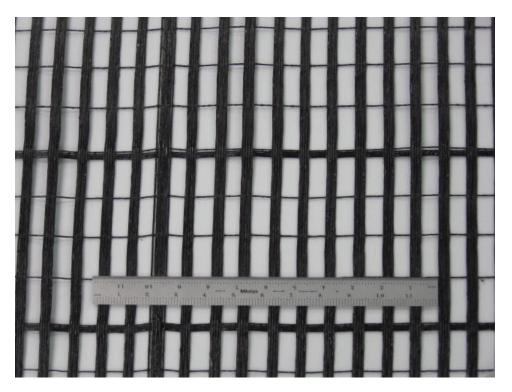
Photo of Miragrid 20XT (machine direction is perpendicular to ruler shown).
